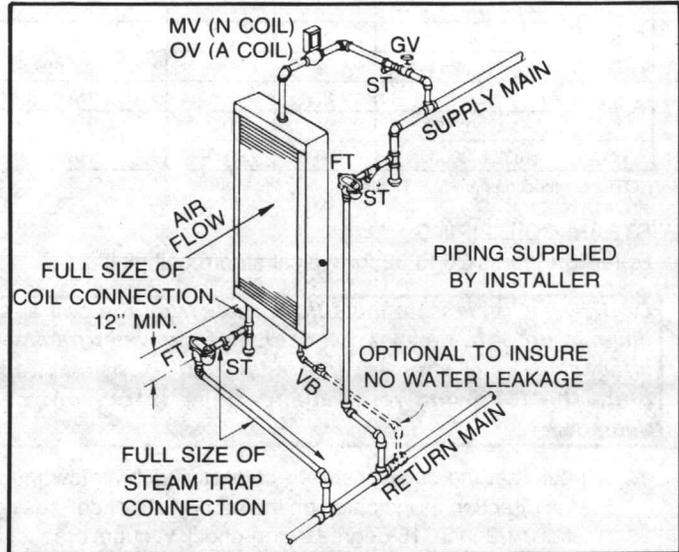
Typical Piping for Type A or N Steam Coils, Vertical Tubes for Horizontal Airflow
